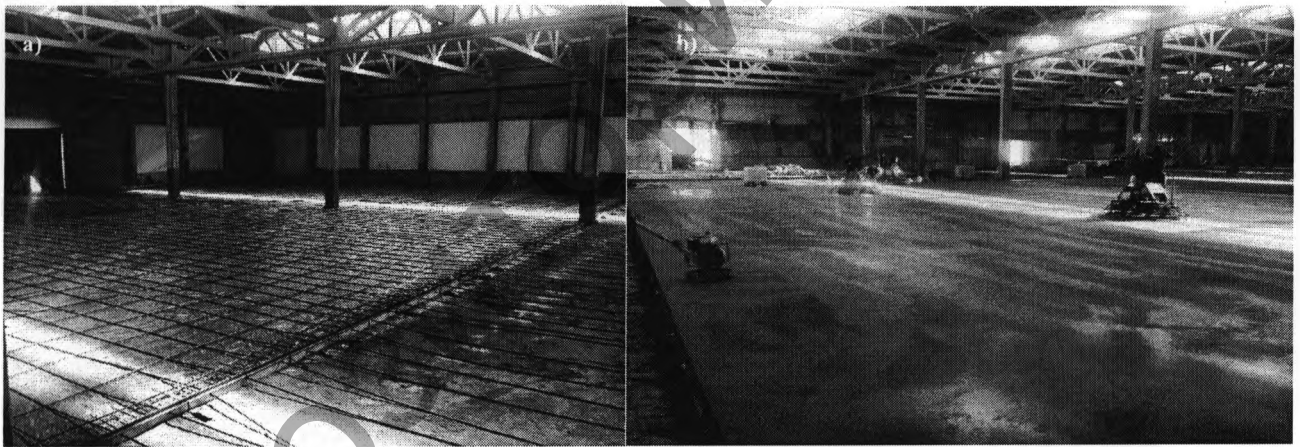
Tendon layout in formwork (a) and slab after concreting (b)
